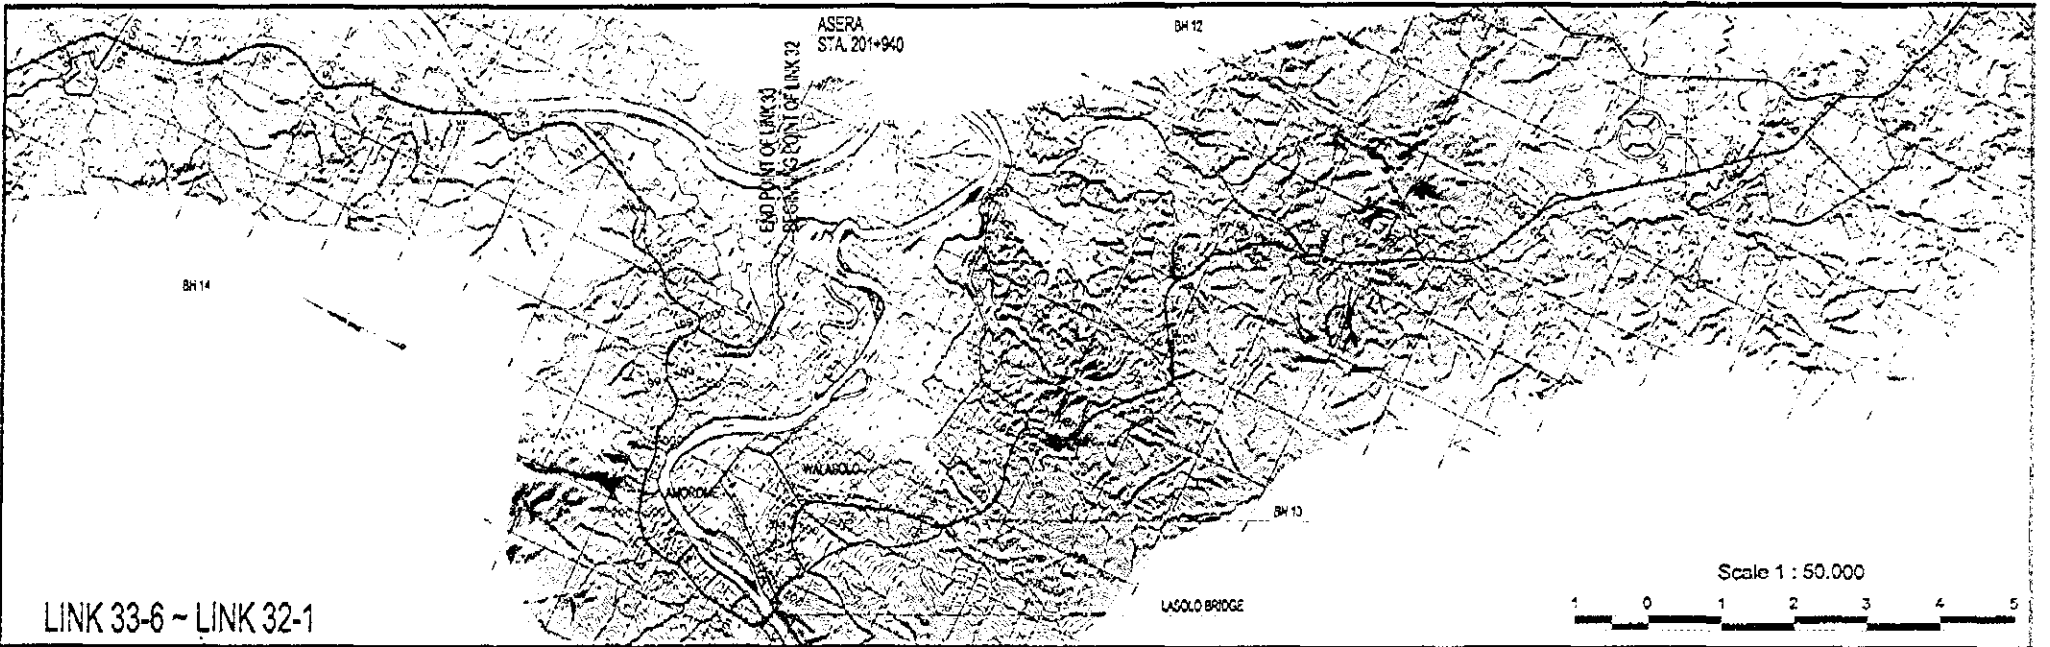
Road Alignment of Umpanga to Sandangpangan (8 of 11)
